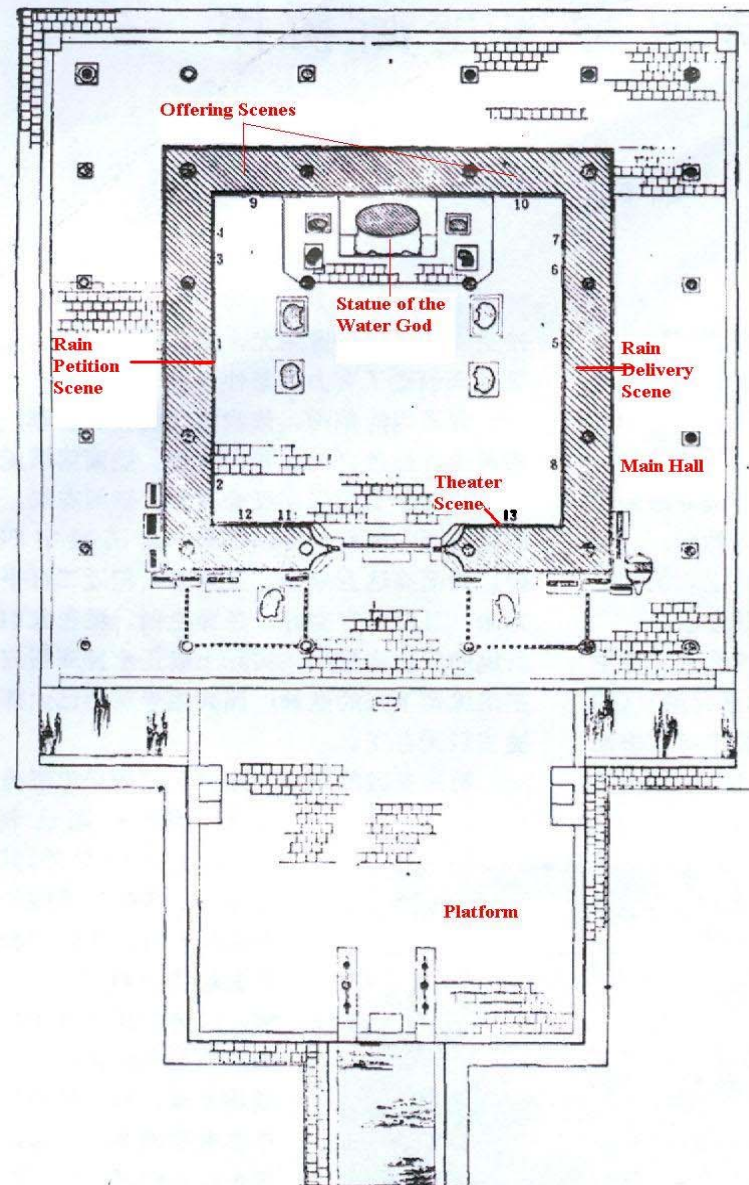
Ground plan of the main hall of the Water God's Temple, dated 1324, Hongdong, Shanxi (After Chai 1981, 87).
